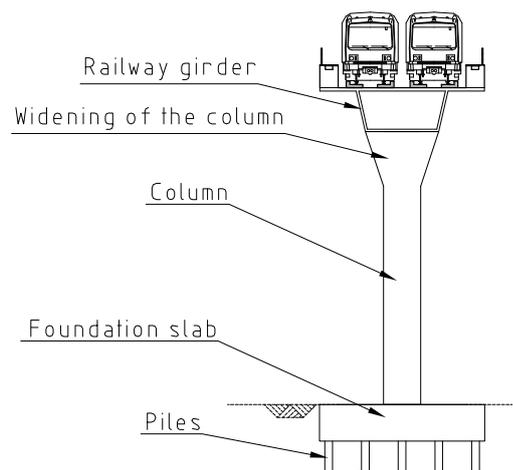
Schematisation of the elevated metro structure with a UHPC box girder
